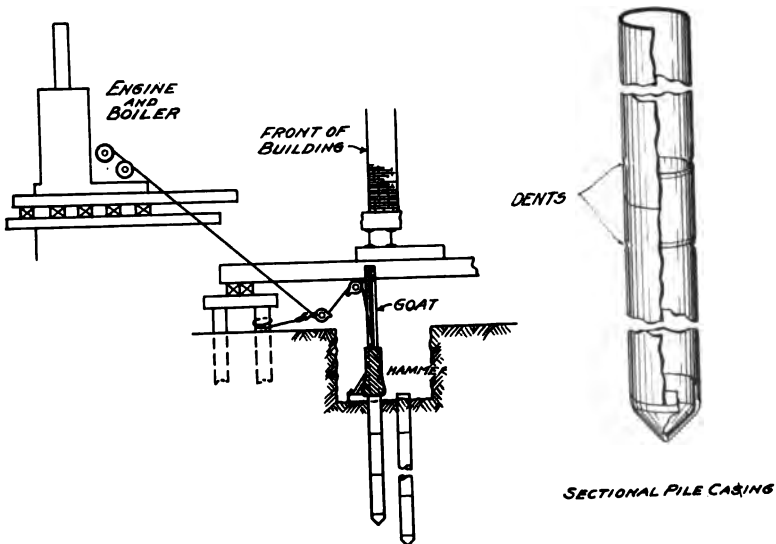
METHOD OF DRIVING PILES FOR UNDERPINNING BUILDINGS.
